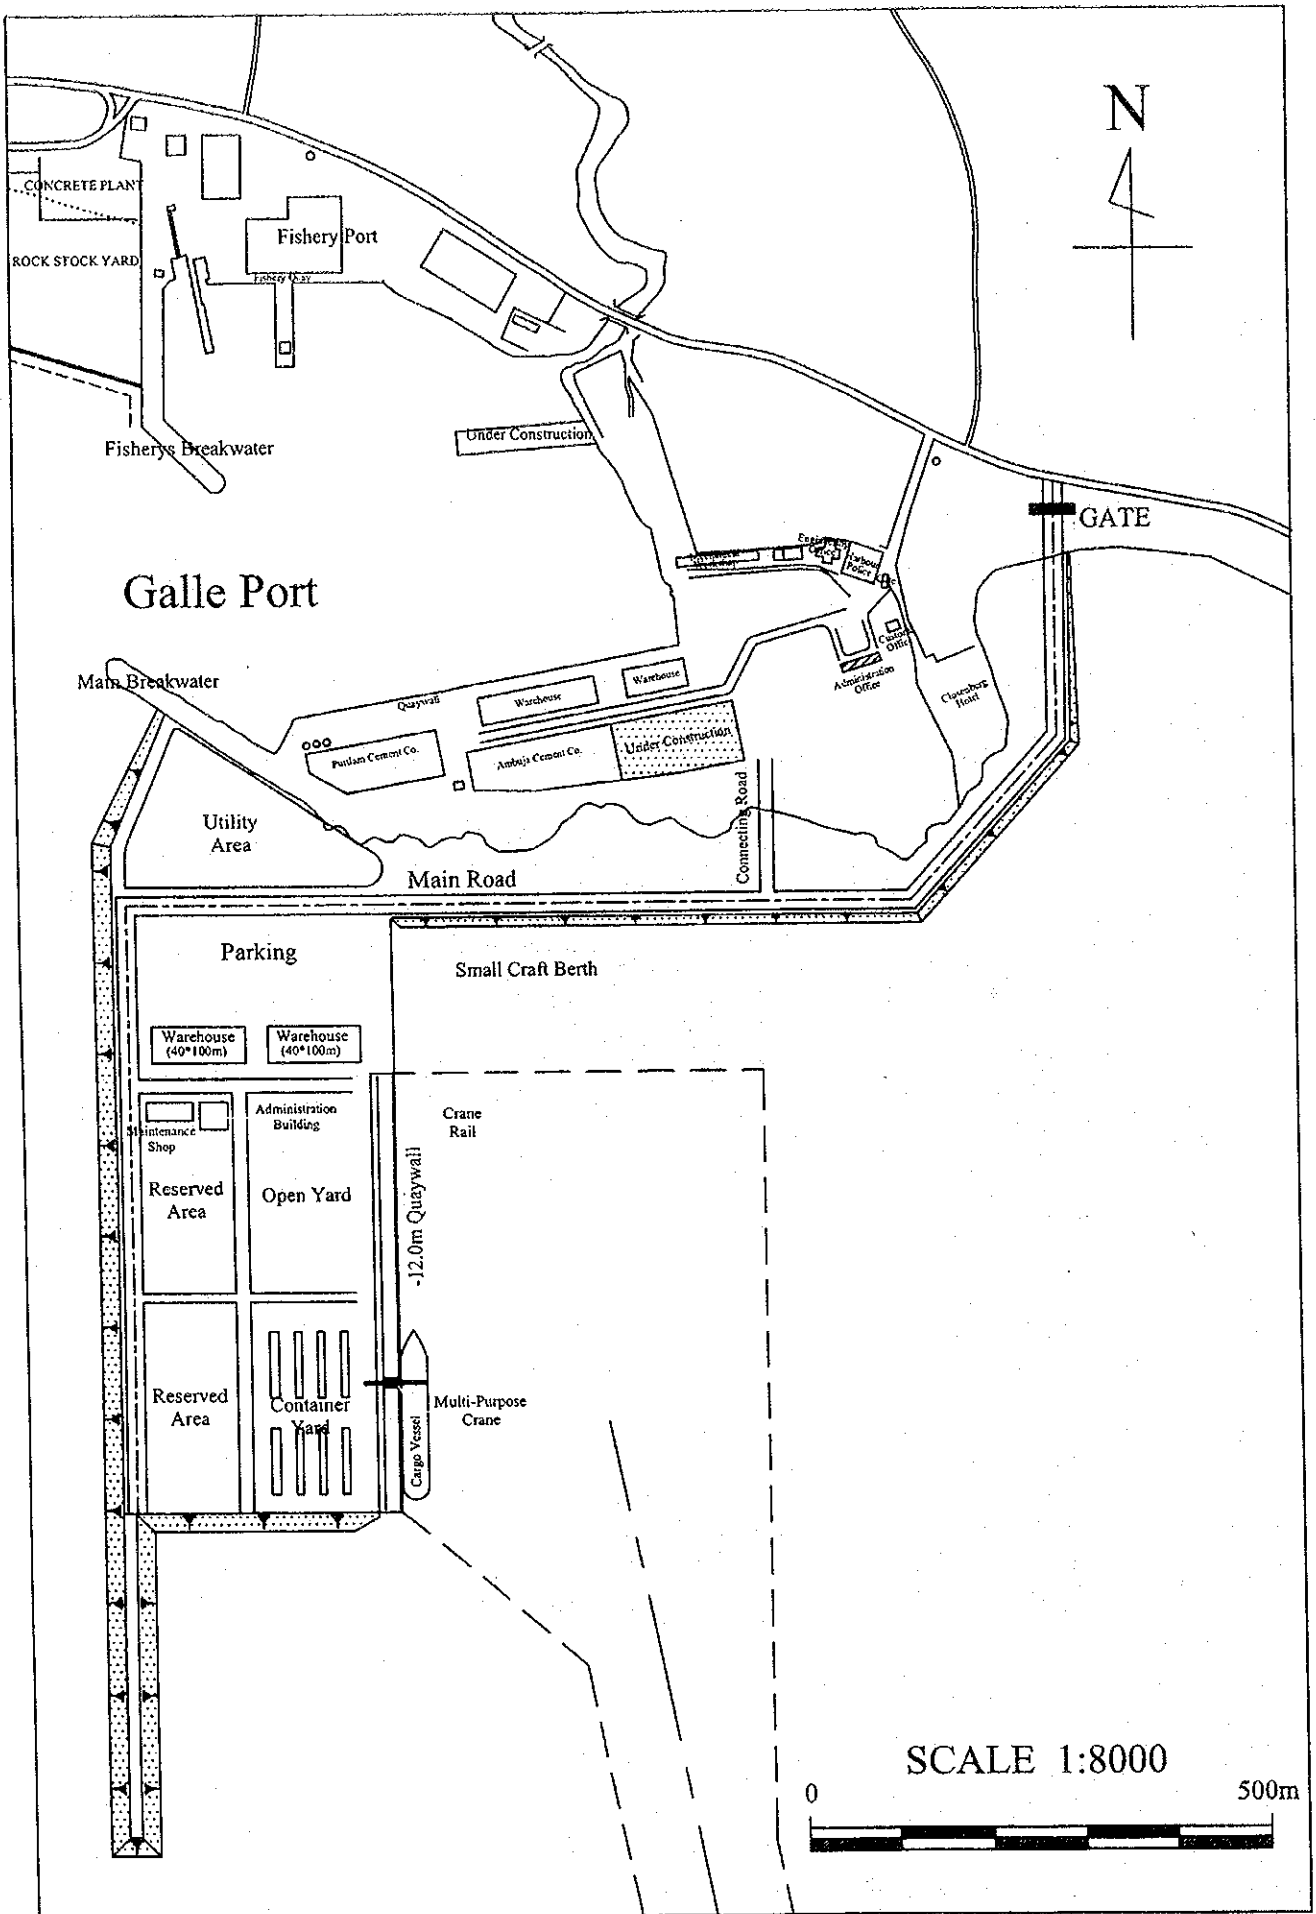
Detailed Layout Plan of Port Facilities
